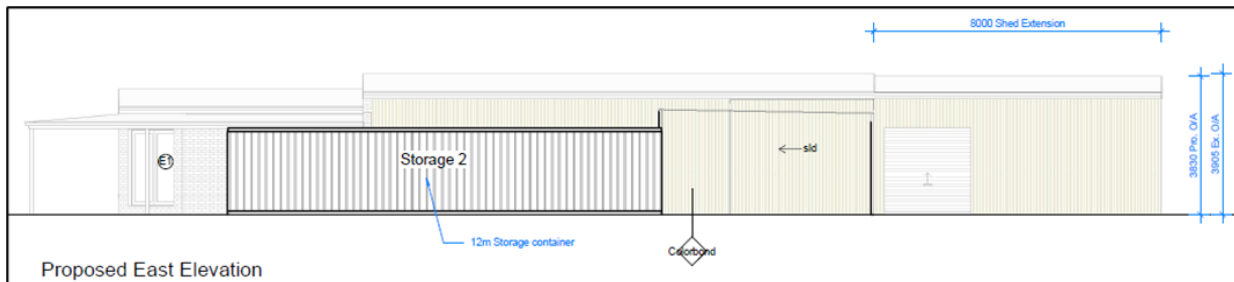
Proposed East Elevation, as viewed from Timothy Lane
